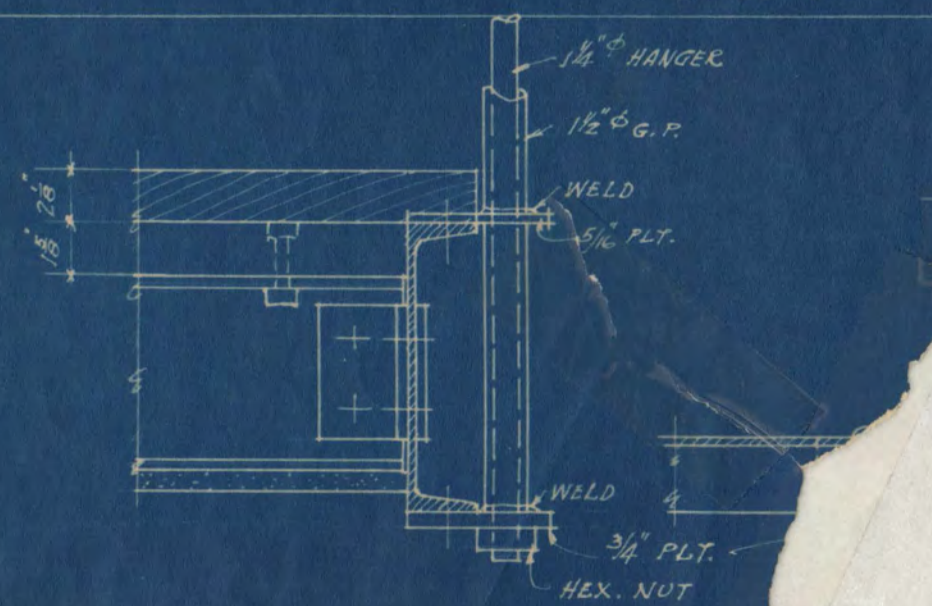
DETAILS OF SPANDEL BEAM OVER WINDOWS 311 TO 314 INCL.
